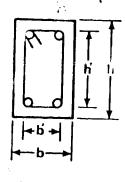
CRACKING STRENGTH au CONTRIBUTION OF STIRRUPS
